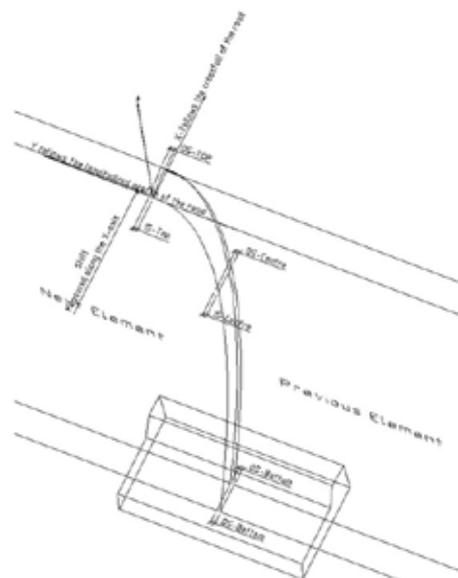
From Novapoint User Manual for Concrete Wall elements.
